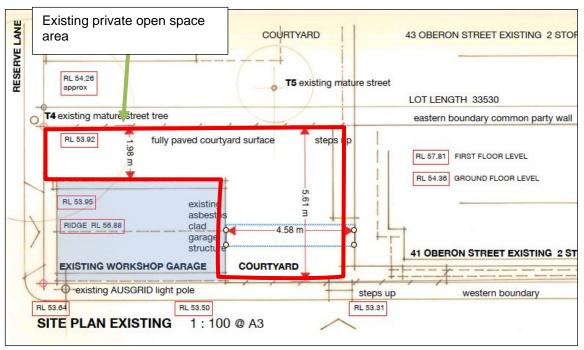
Mark-up of Drawing No. DA.02 of the architectural plans prepared by Studio GA illustrating the existing private open space area.
